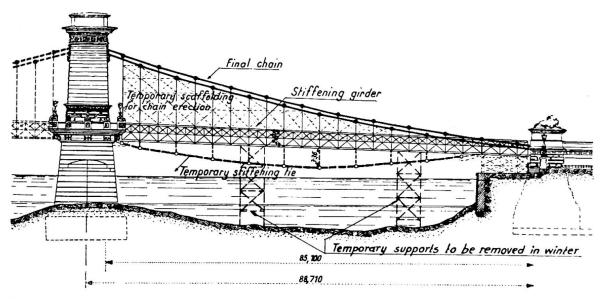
Erection (readjustment) scheme of the chains in the right span of the bridge showing new stiffening trusses and temporary welded stiffening-tie under-
